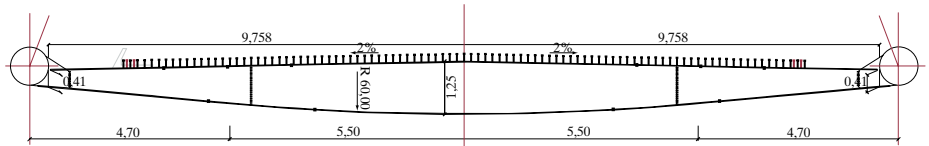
Detail of a typical transverse beam placed every 5 m (Units: m)
